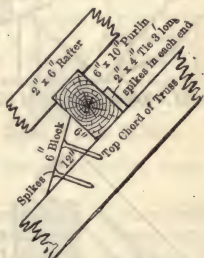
A. Purlin-connection. Purlins on Top of Truss-chord
